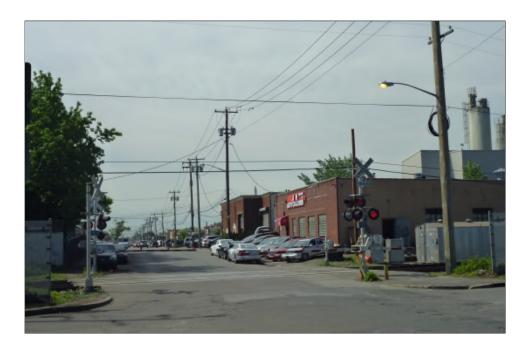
Urban Avenue grade crossing looking south. Area to the south of LIRR ROW is mixed industrial and commercial; area to the north of LIRR ROW is densely settled residential. Note structure on the southwest corner of the crossing – 117 Urban Avenue (foreground) is a potential property taking.
